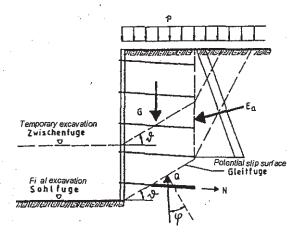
Two-part wedge analysis for internal stability of a near vertical nailed wall (adapted from the German general licence of *Soil Nailing System "Bauer"*, 1984)
